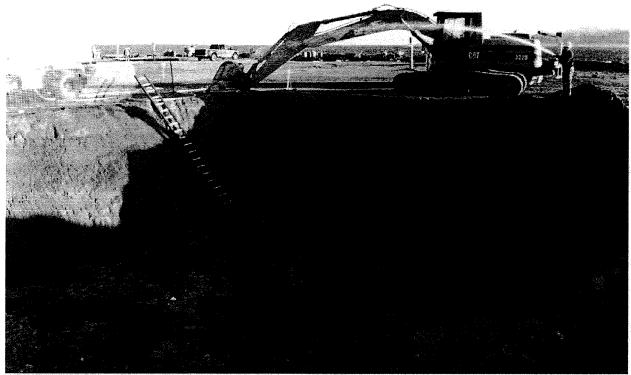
The sand and gravel subgrade materials are moisture conditioned and compacted following excavation.
